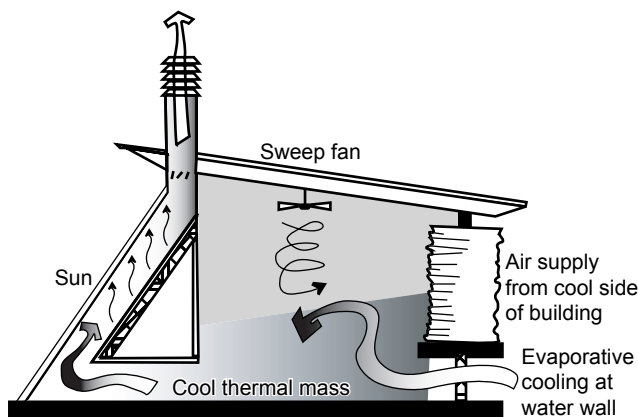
Solar trombe wall with chimney Wesley College, NSW
